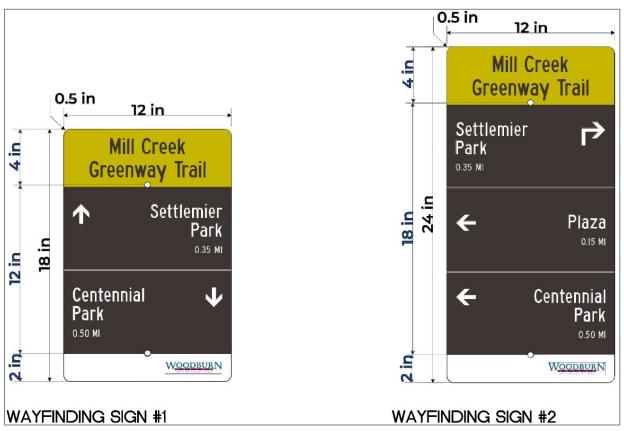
Off-Street Public Bicycle/Pedestrian Facility Signage Models 1 & 2
